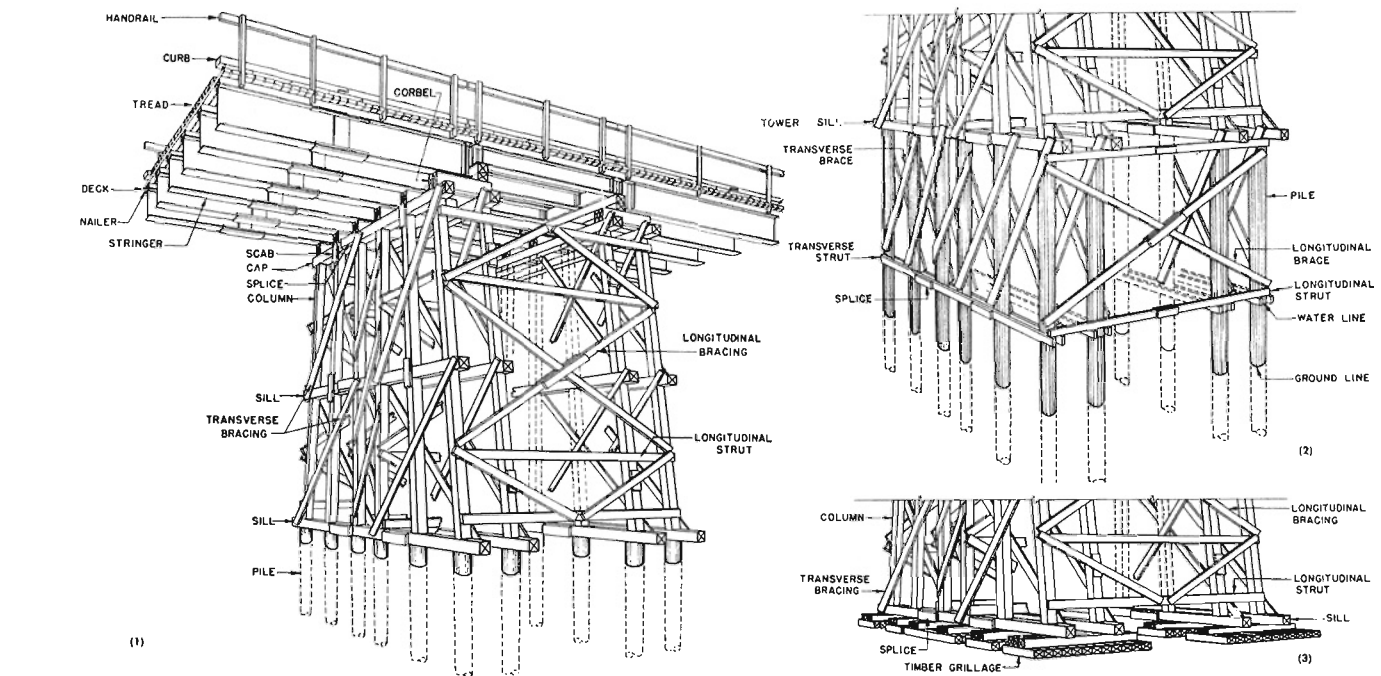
Highway bridge, class 50, double-lane, steel stringer spans, framed timber tower:
